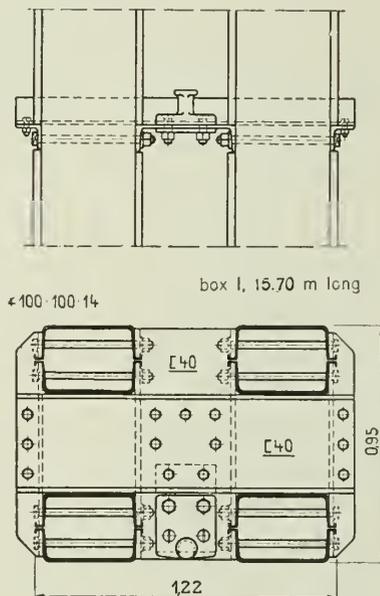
Steel Pile Dolphin. Union Box Piles.
